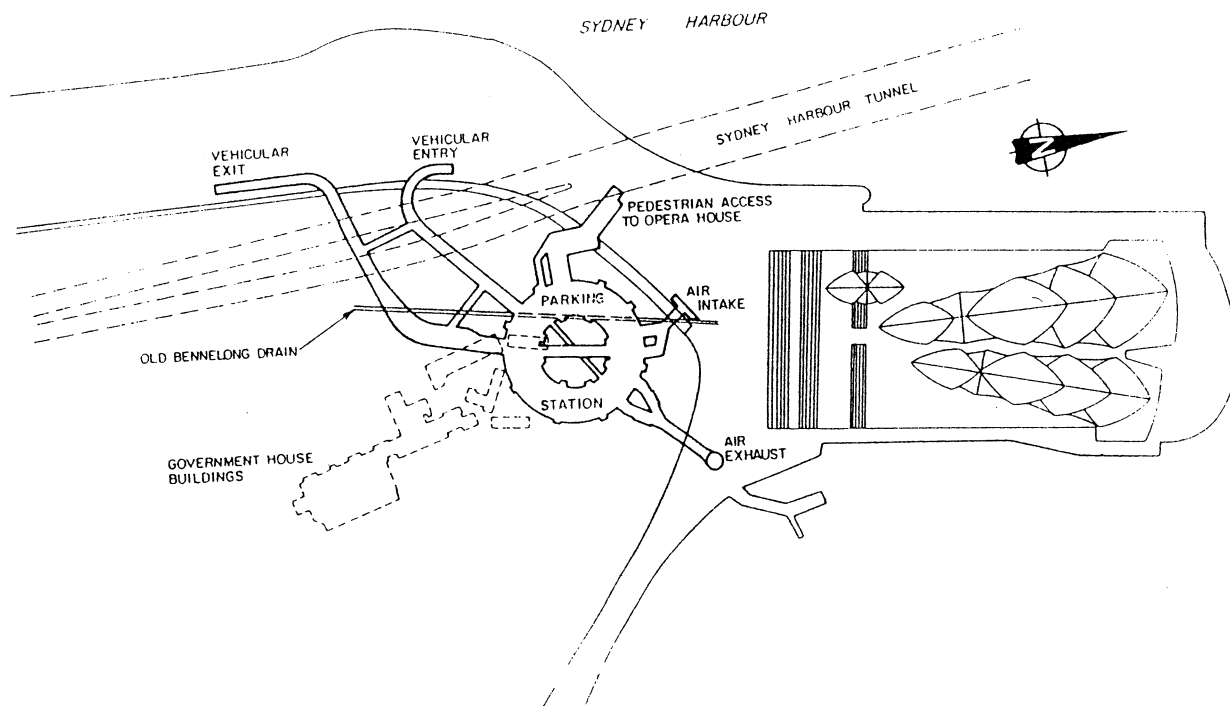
Layout of Bennelong Point (Opera House) Parking Station
